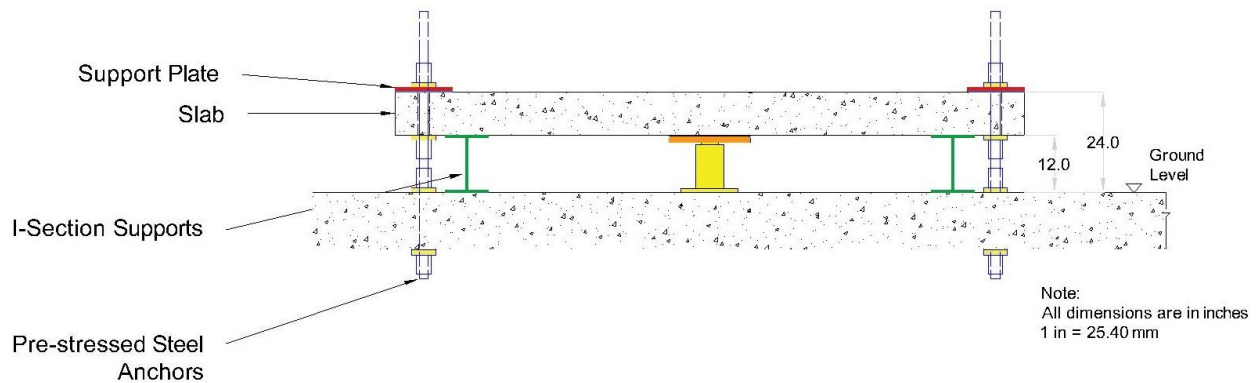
Test Set Up for Sandwich Slab Specimen C
